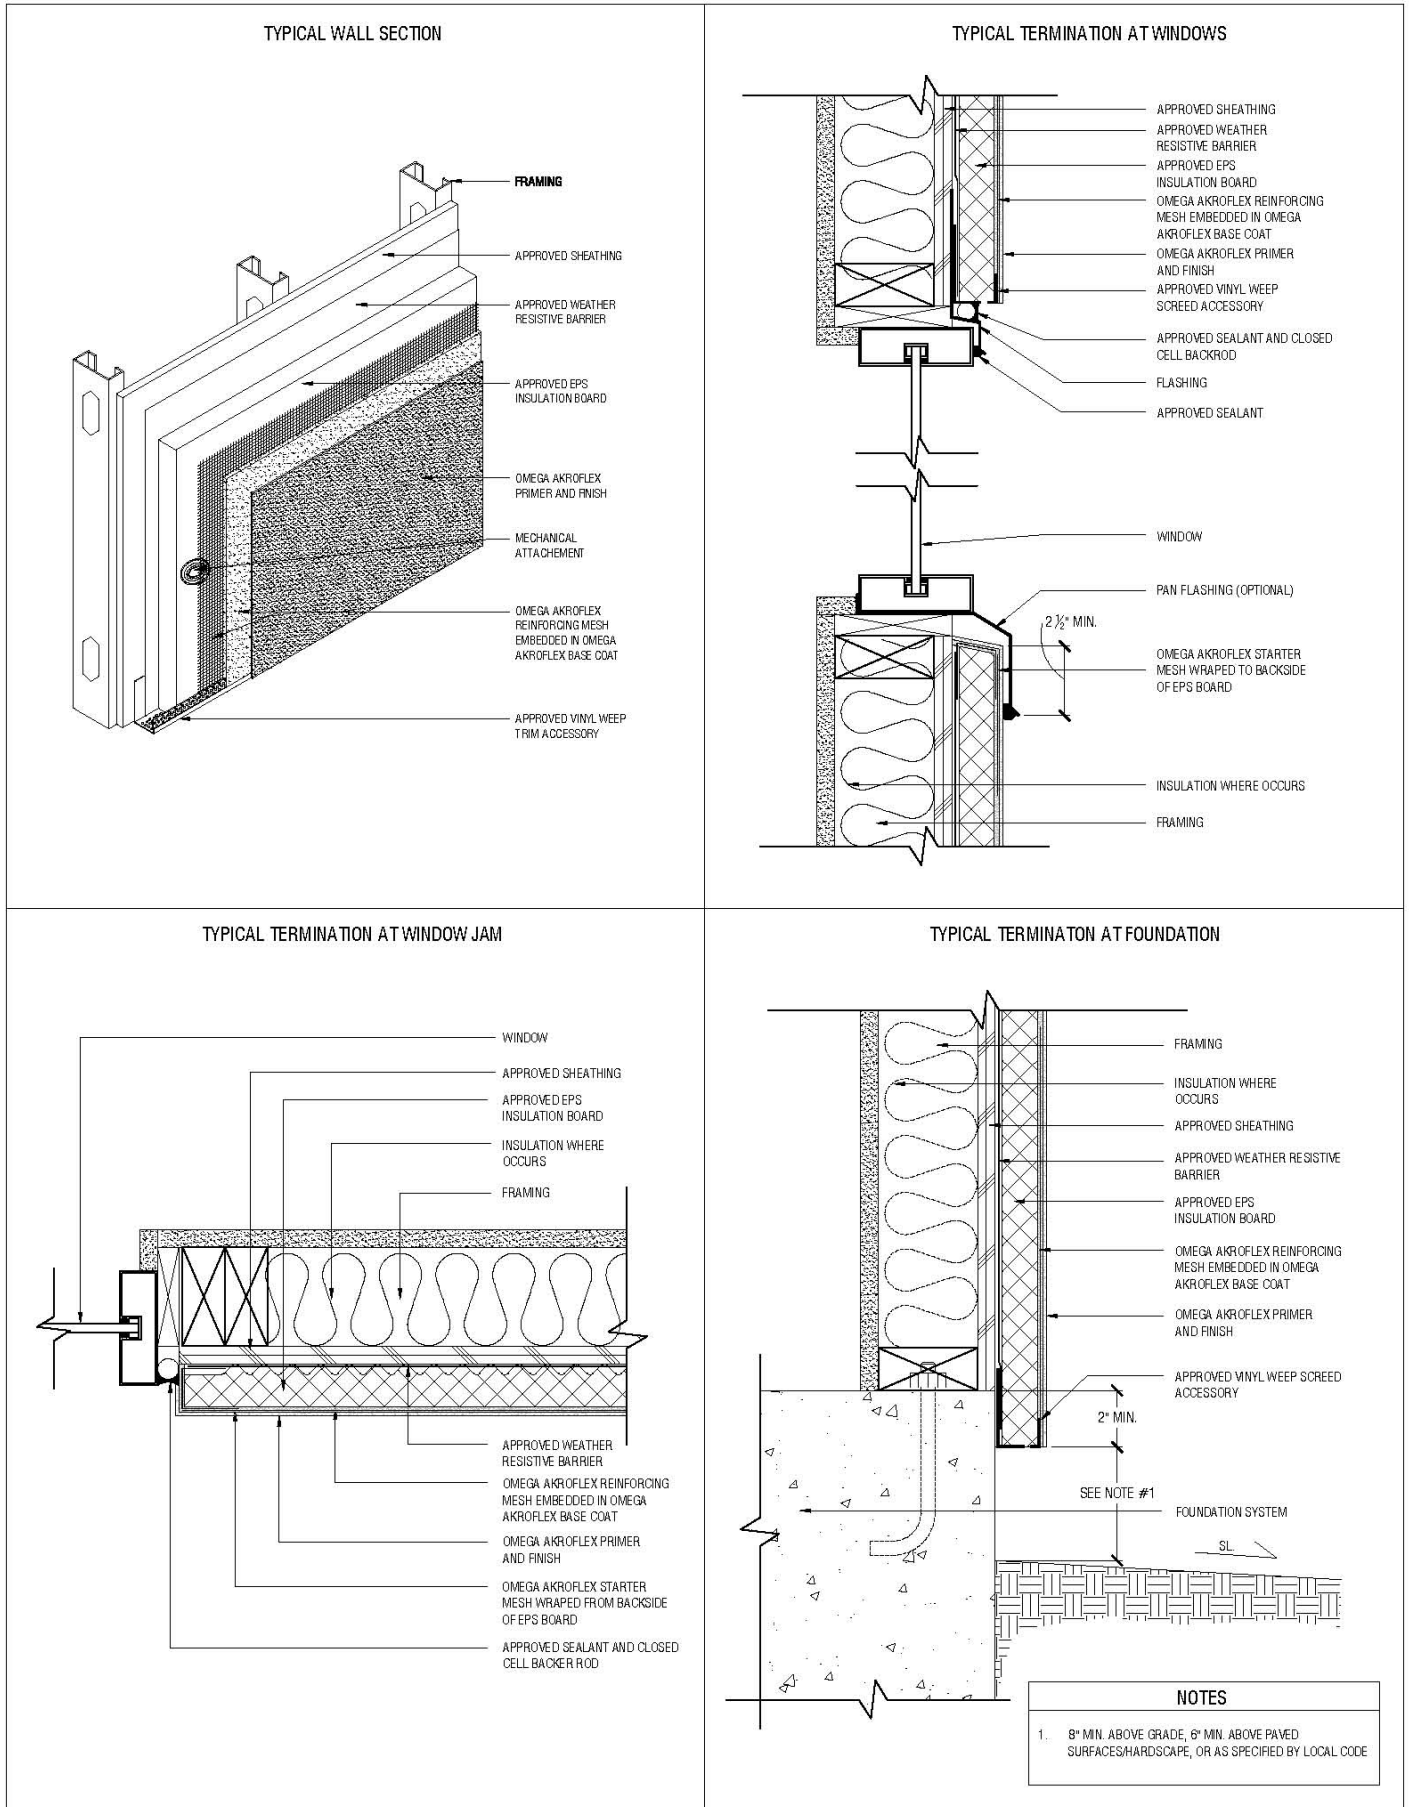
TYPICAL INSTALLATION DETAILS FOR THE AKROFLEX WM SYSTEM
